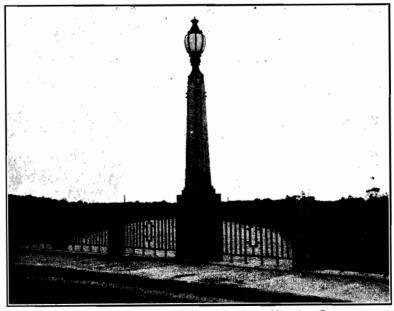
Maribyrnong River Bridge—Showing Parapet and Lamp Standard.
